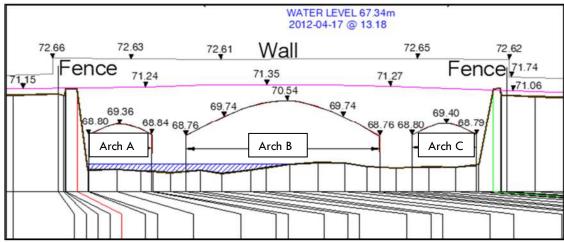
Cross Section Details for Athea Bridge (Upstream Face, looking Downstream) [04GAL00180u]
